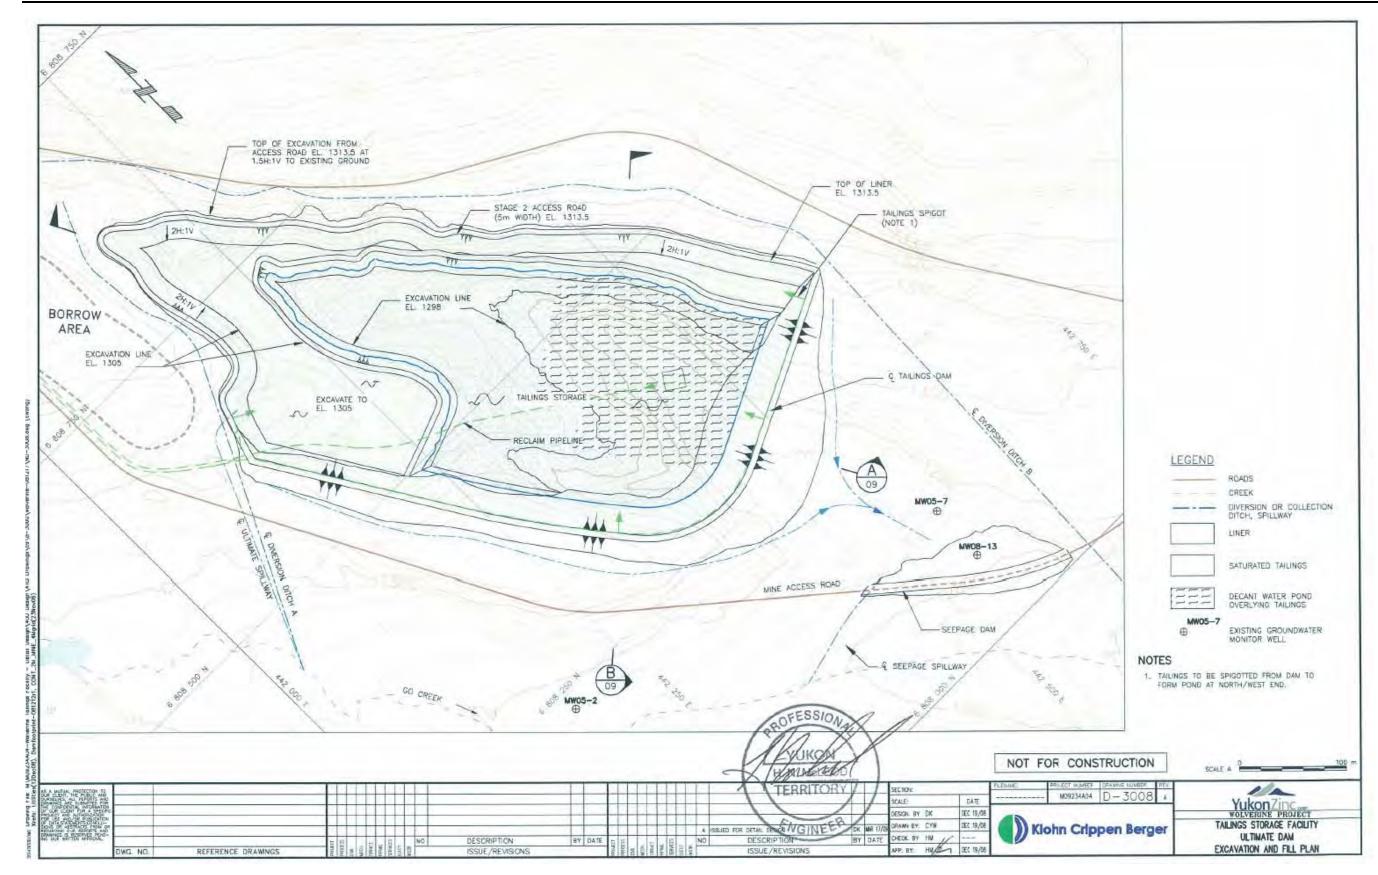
Tailings Facility Ultimate Dam Excavation and Fill Plan
